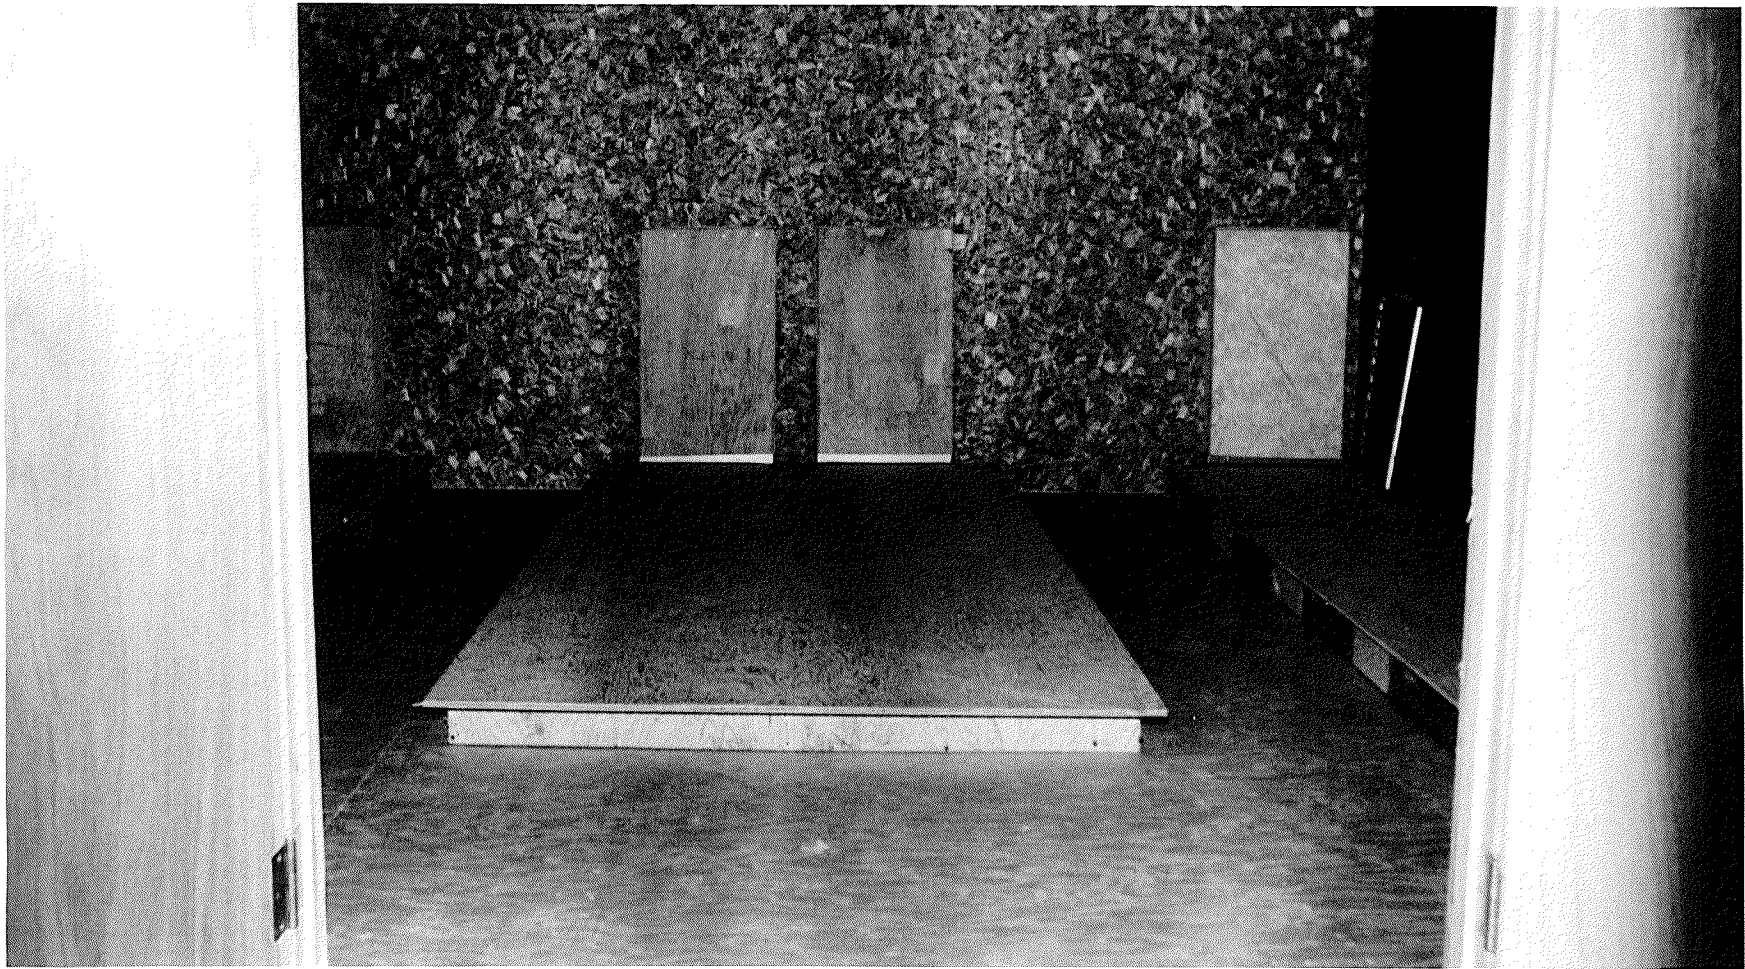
Exhaust ducts at floor level under pallets, leading outside through the wall.
